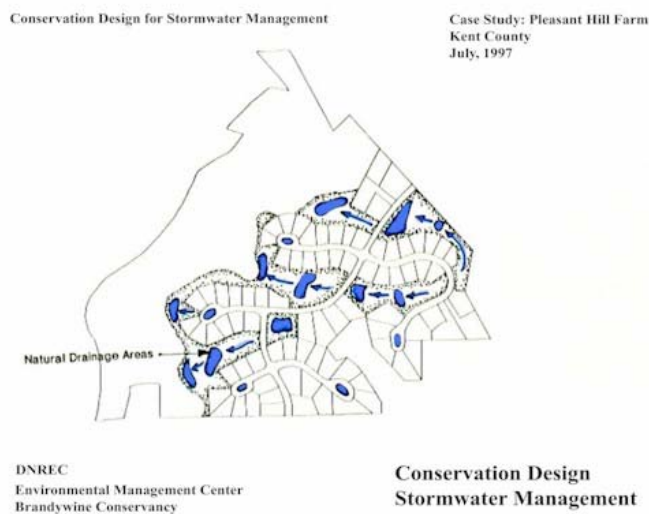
The natural surface can provide stormwater drainage pathways
